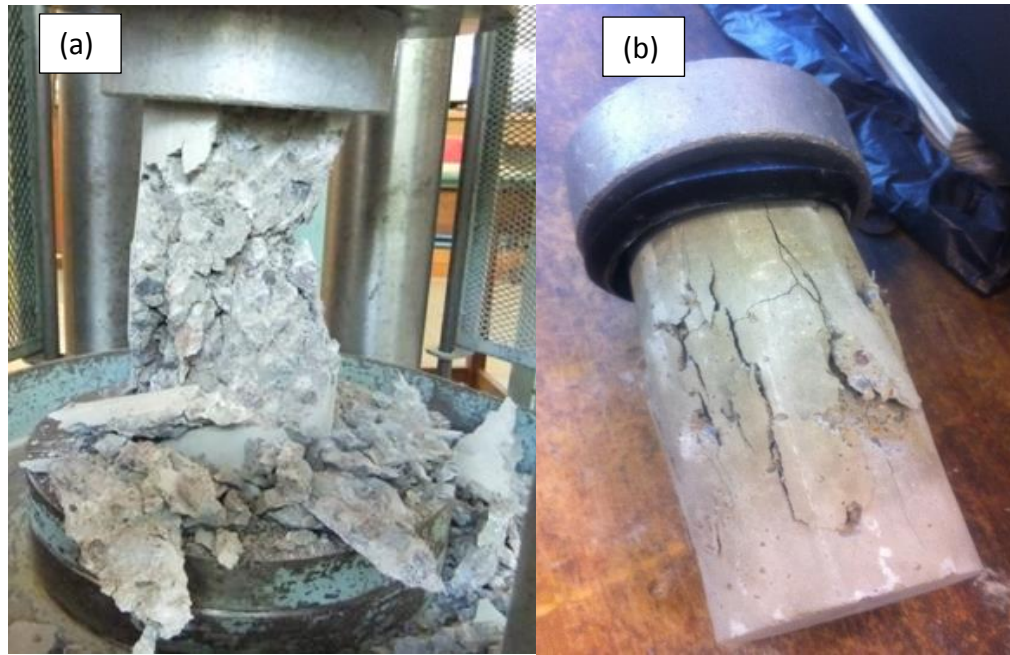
Failure behaviour of (a) plain concrete and (b) fibre reinforced concrete in the compression test
